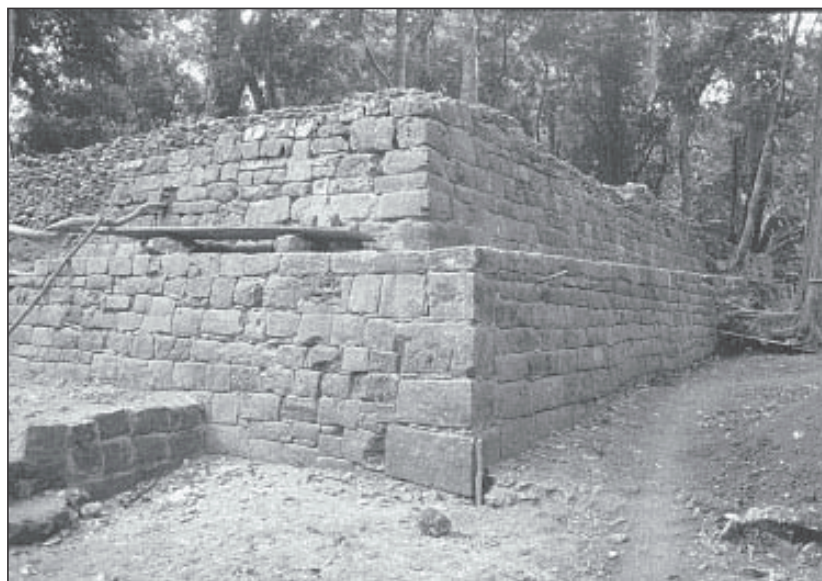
Faced wall after restoration (north-eastern corner of the building). Our restoration only used original stones and no new blocks were added.
